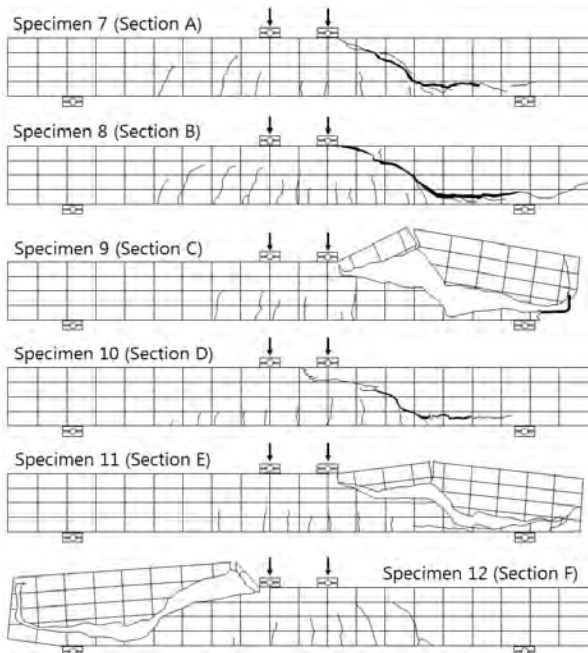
Crack pattern of specimen 7~12 at the end of test
